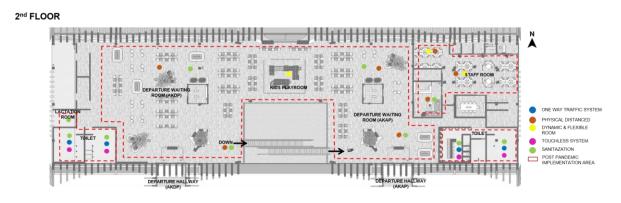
Bus Terminal 2<sup>nd</sup> Floor Plan (Author, 2025)
